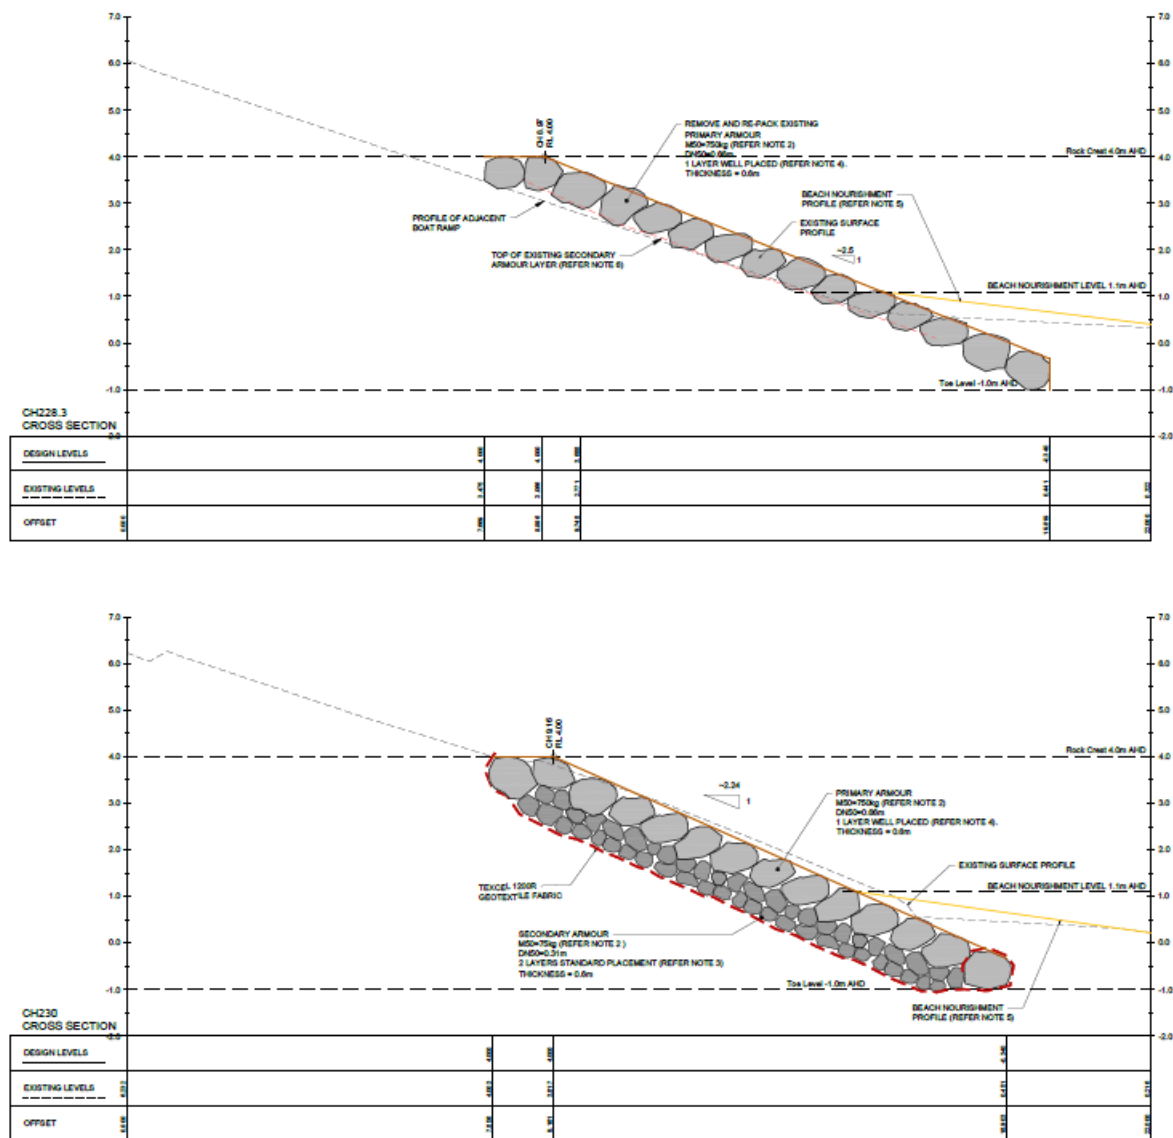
Eastern End Sections Sheet 1 (Dwg No. PA2559-RHD-00-DR-MW-1101)
